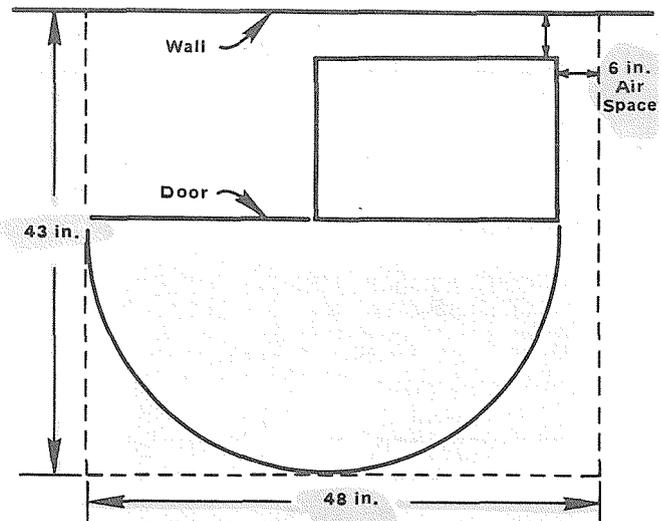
MINIMUM DCEC FLOOR SPACE
